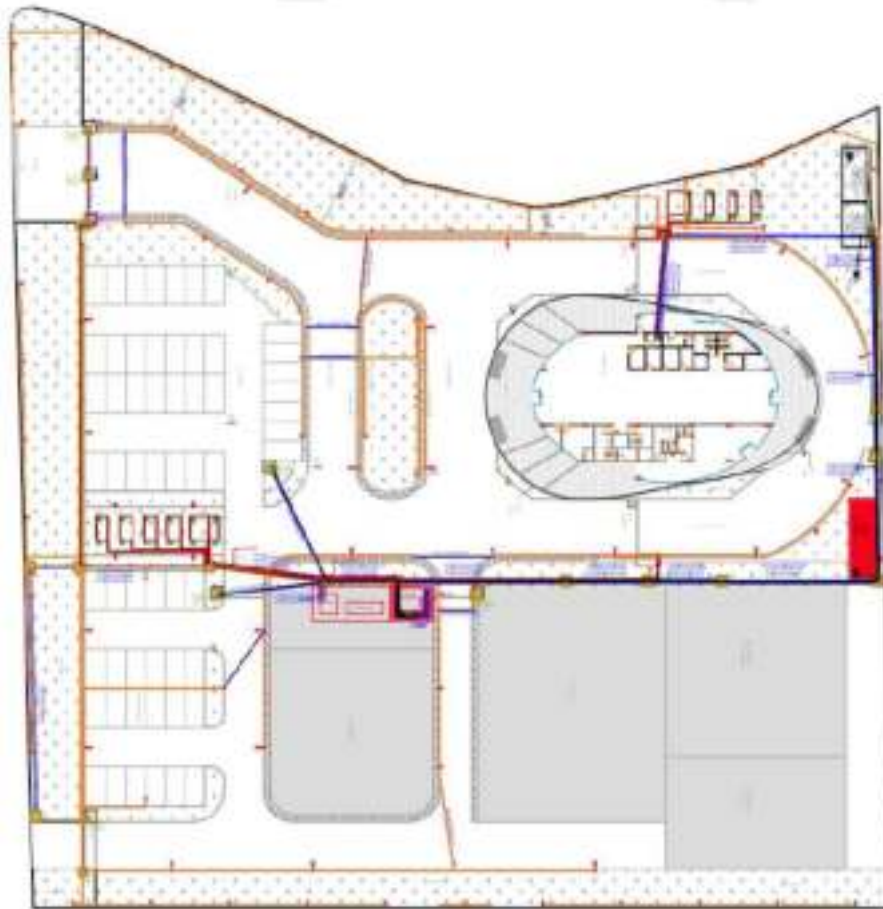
LAYOUT OF EXTERNAL LIGHTING ARRANGEMENT
